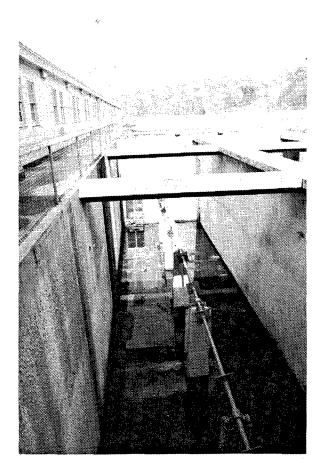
Building 409: One of the Flocculation Tanks on the north side of the building.
